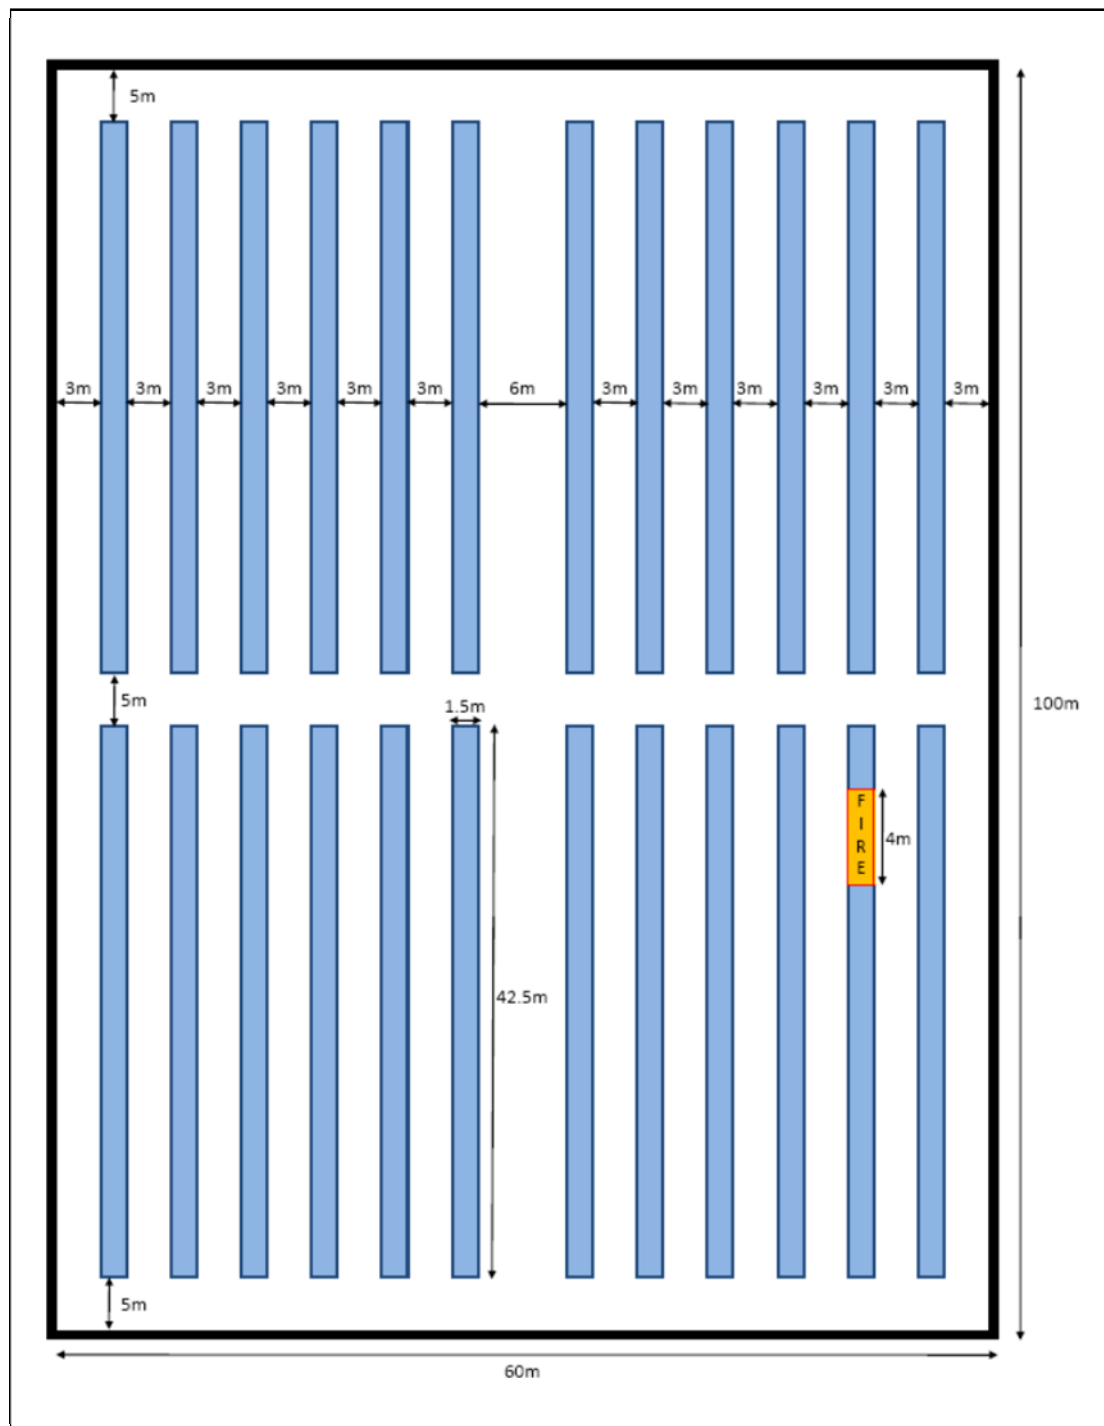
Plan view of large warehouse showing warehouse & rack dimensions, and fire position.
